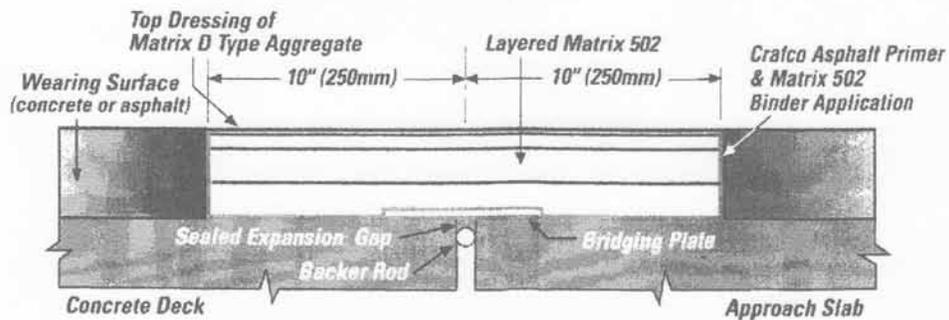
Typical Matrix 502 Asphaltic Plug Bridge Joint System
